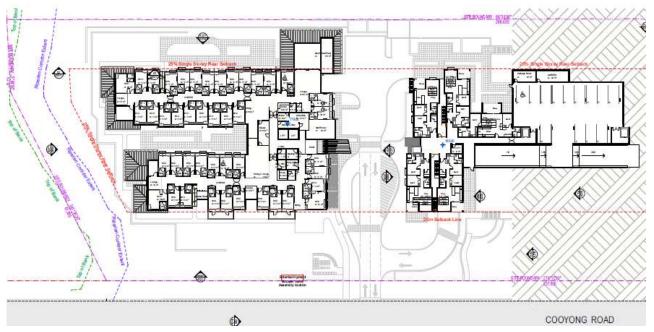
Upper Level Floor Plan – Residential Aged Care Facility (Source: Calder Flower Architects 2020)
